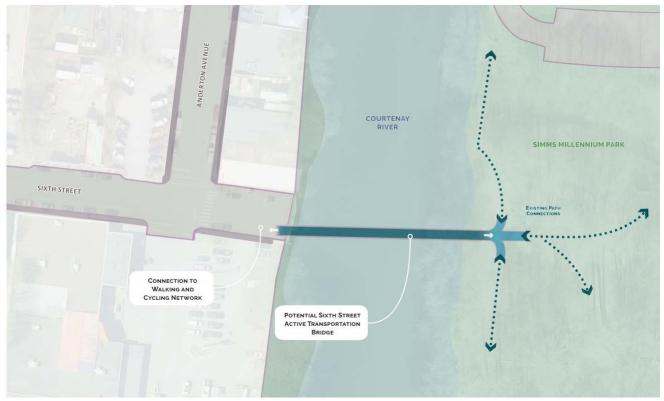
Conceptual Location and Connections of the Sixth Street Multi-Use Bridge
